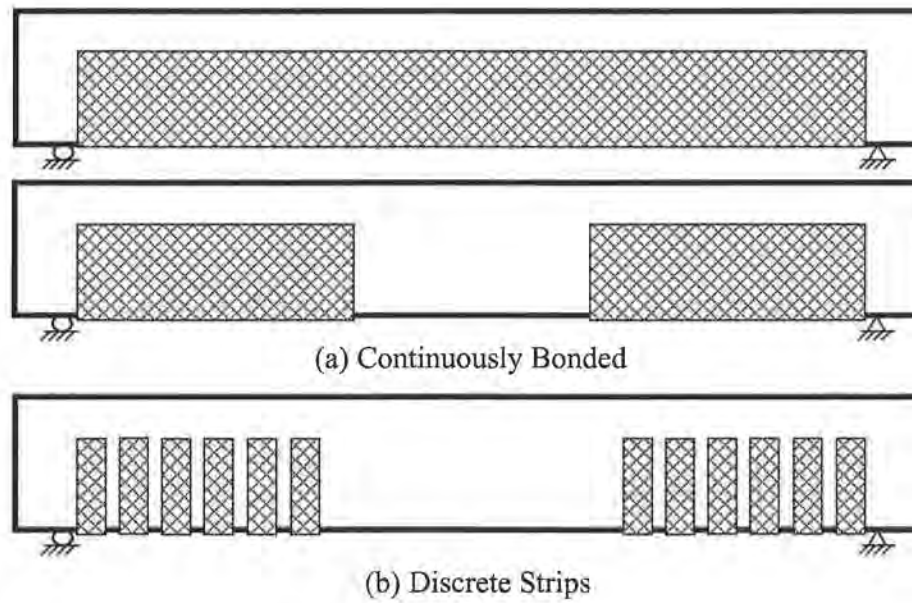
Longitudinal Configurations for External FRP Shear Reinforcement
